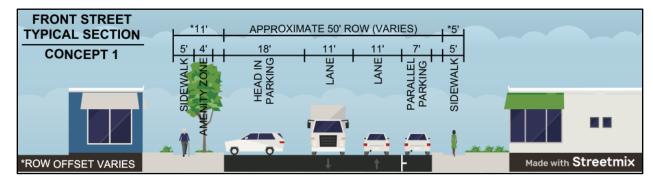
Front Street Parking Concept 1 - Head In/Parallel Parking
